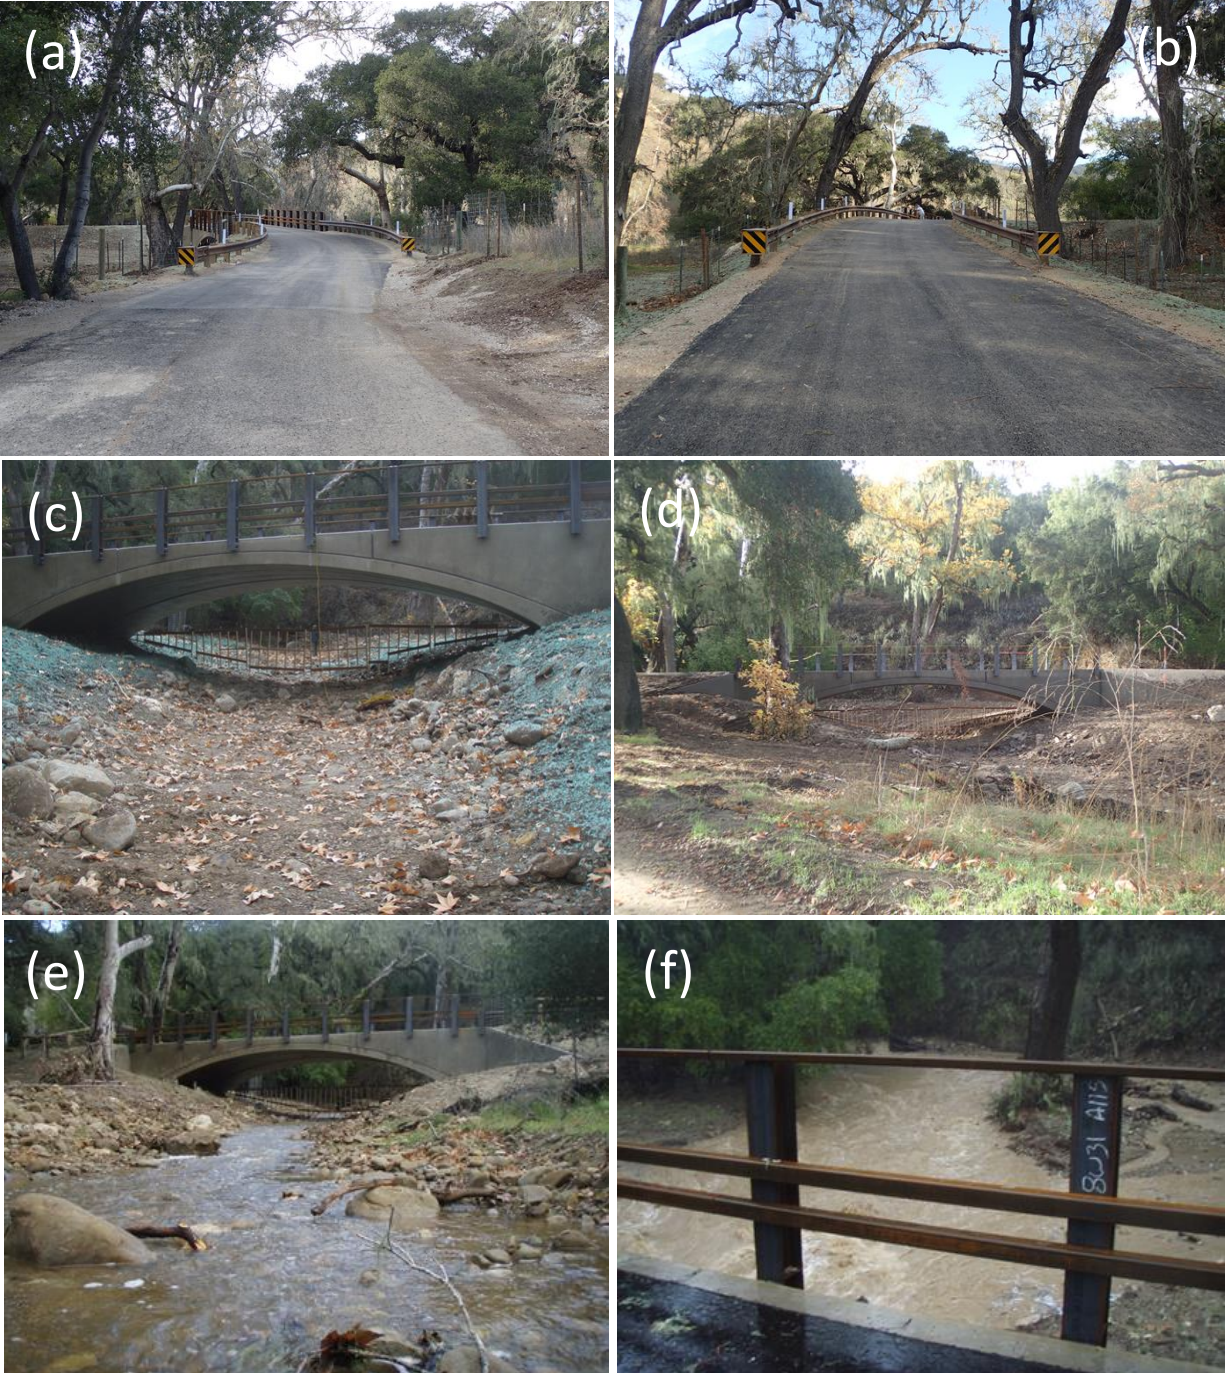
The completed project looking (a) north across the bridge, (b) south towards the bridge, (c) upstream at the bridge, and (d) downstream at the bridge, and during the (e) 1/18/17 storm and (f) 2/17/17 storm.
